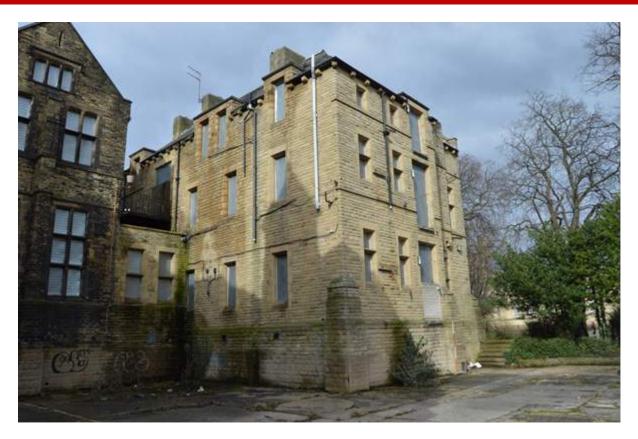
The rear and south facing elevations, along with its single story linking structure, of the Nurses' home. Scale 2m.
